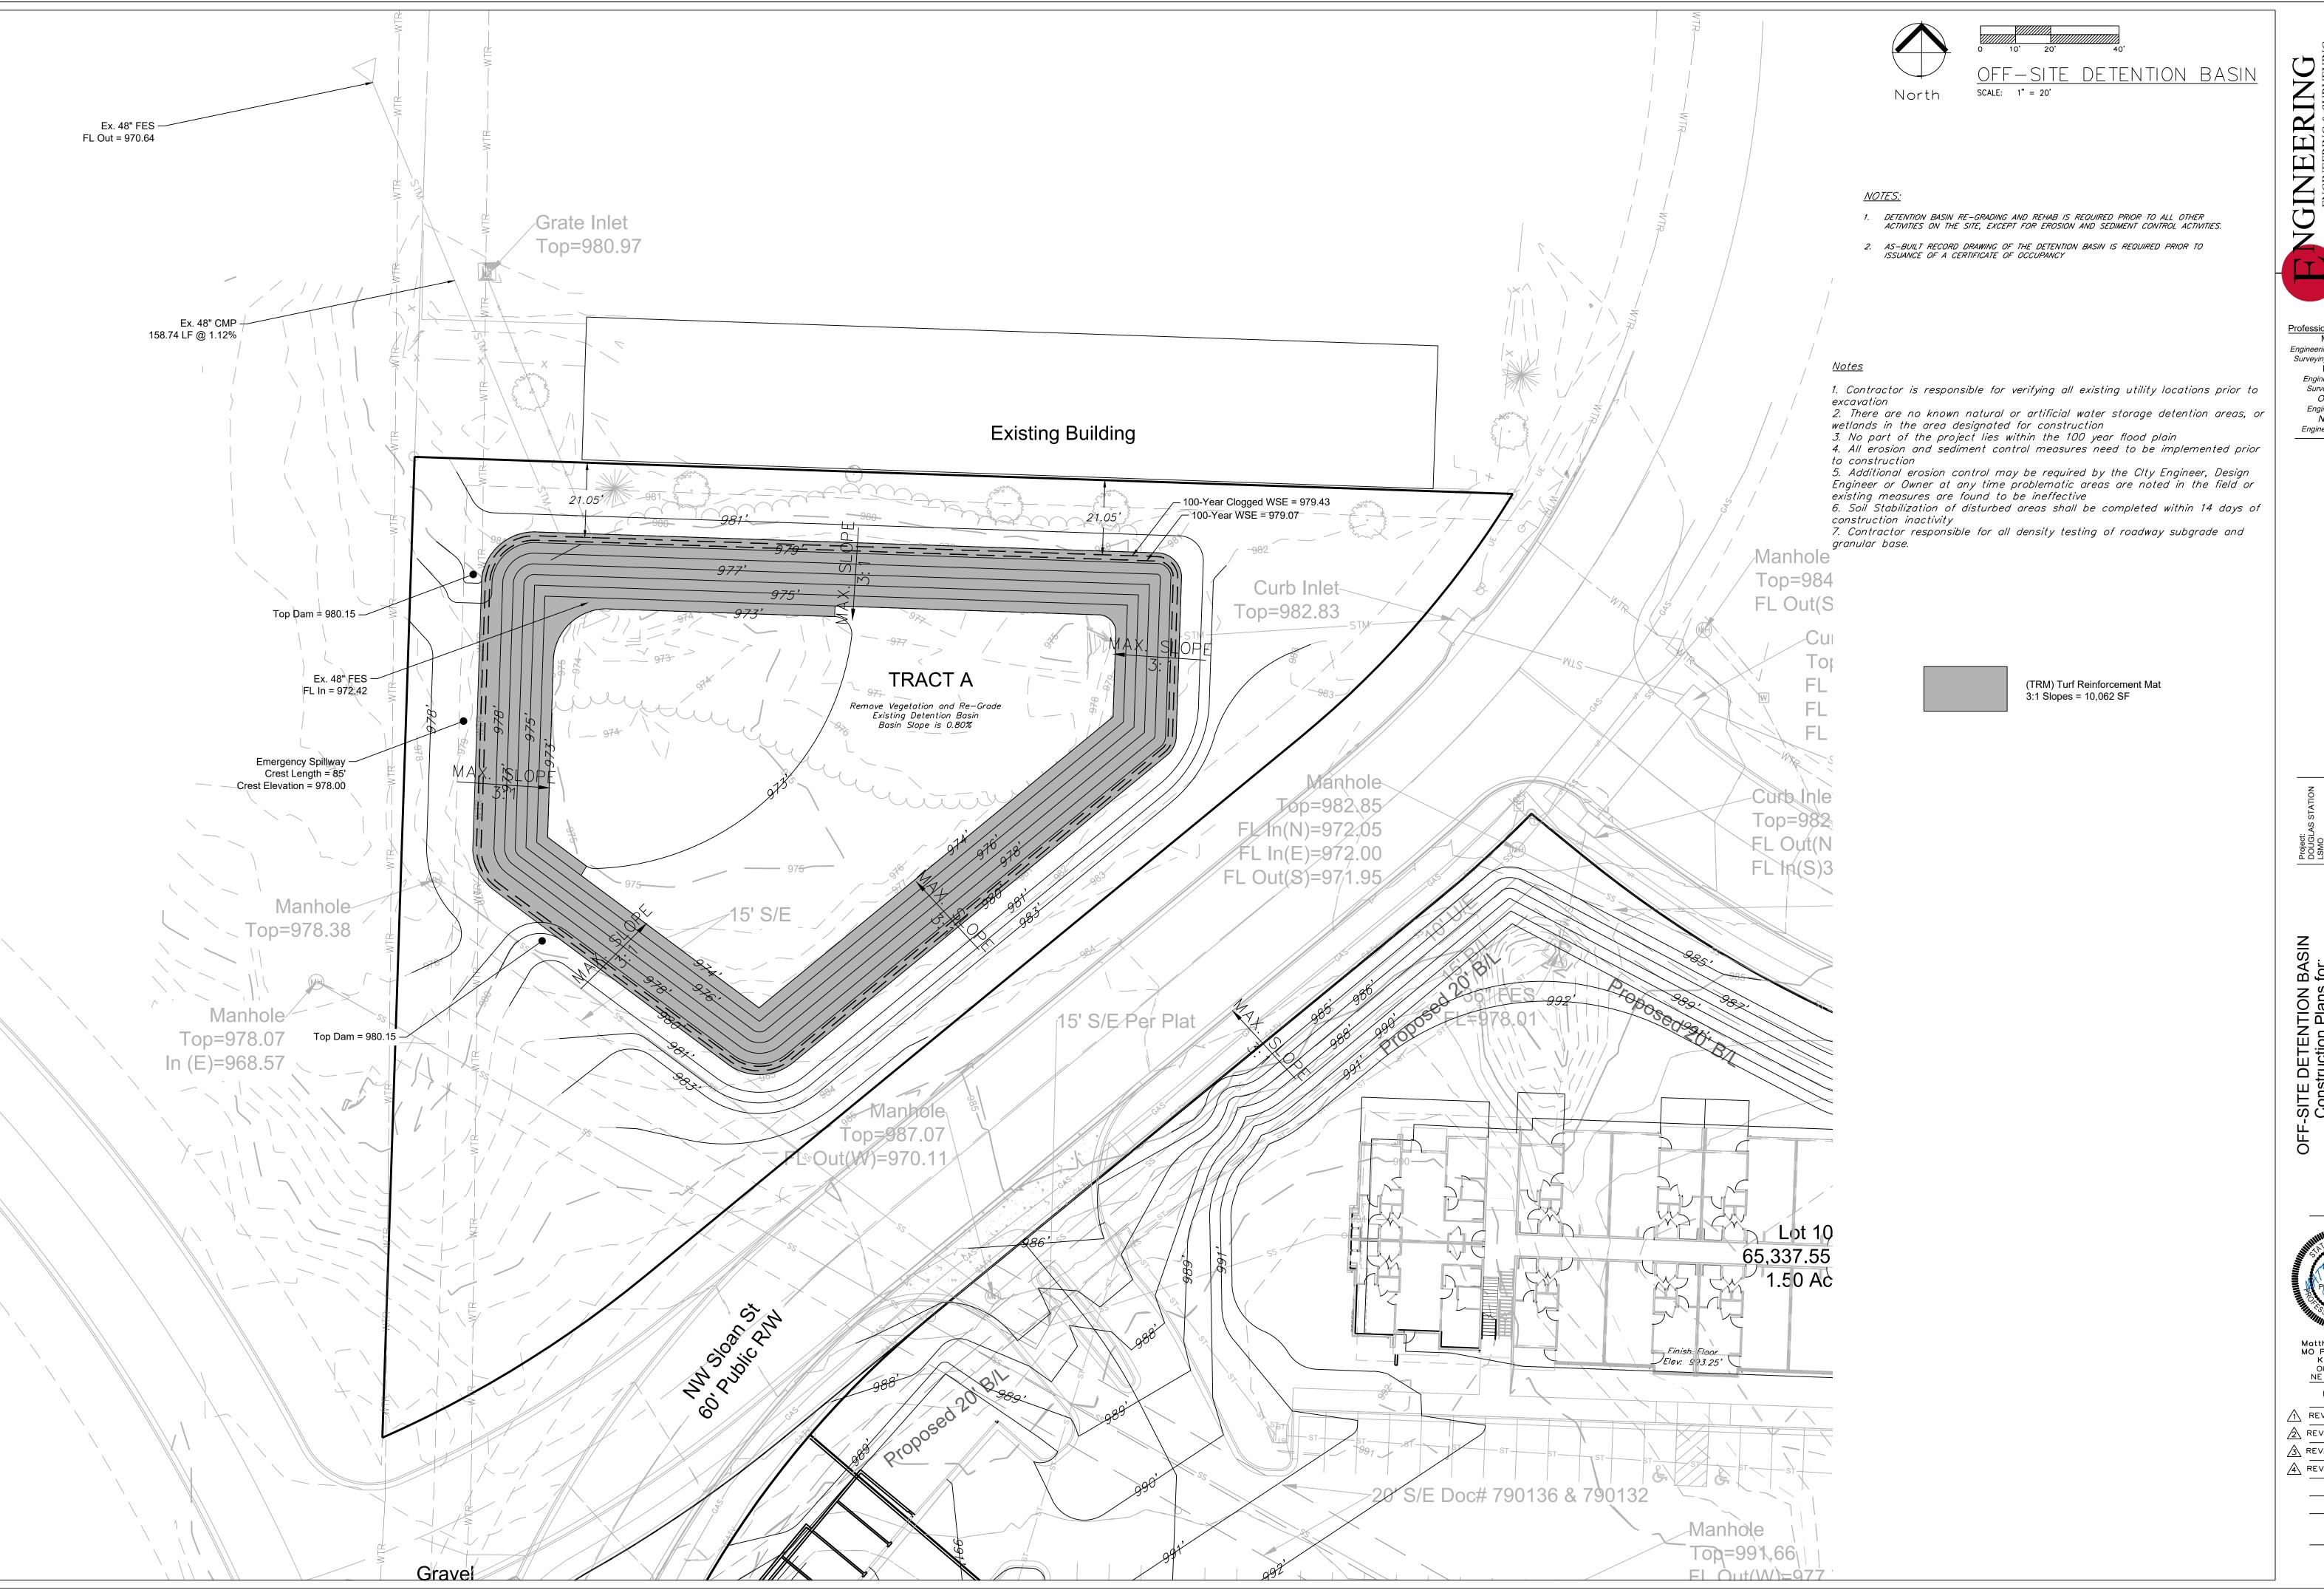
EXHIBIT G PROPOSED DETENTION BASIN PLAN
